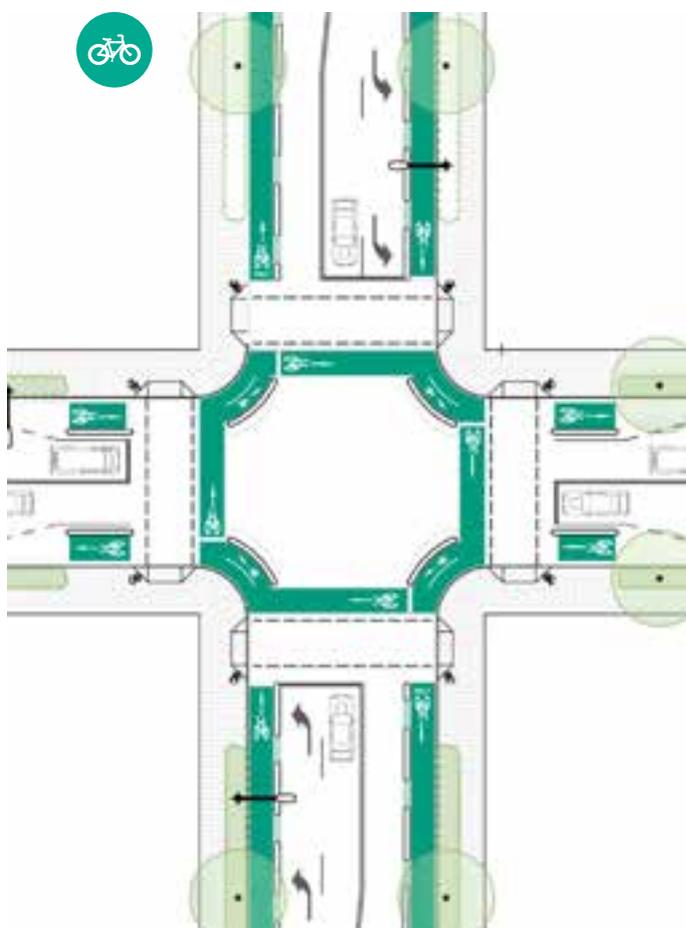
Bicycle path (one-way), protected signalled intersection - plan
